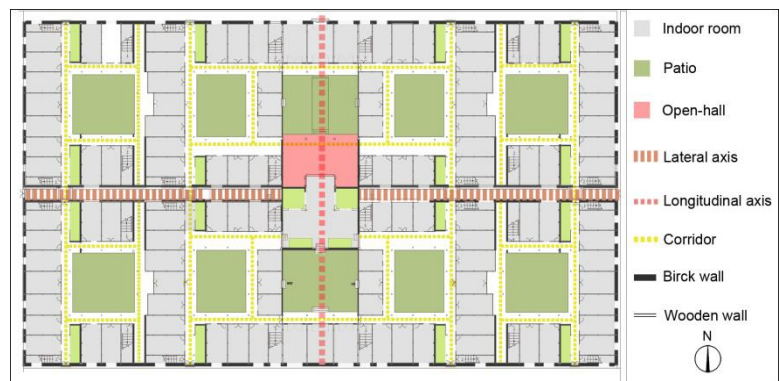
Layout and configuration of Thousand Pillar Dwelling
